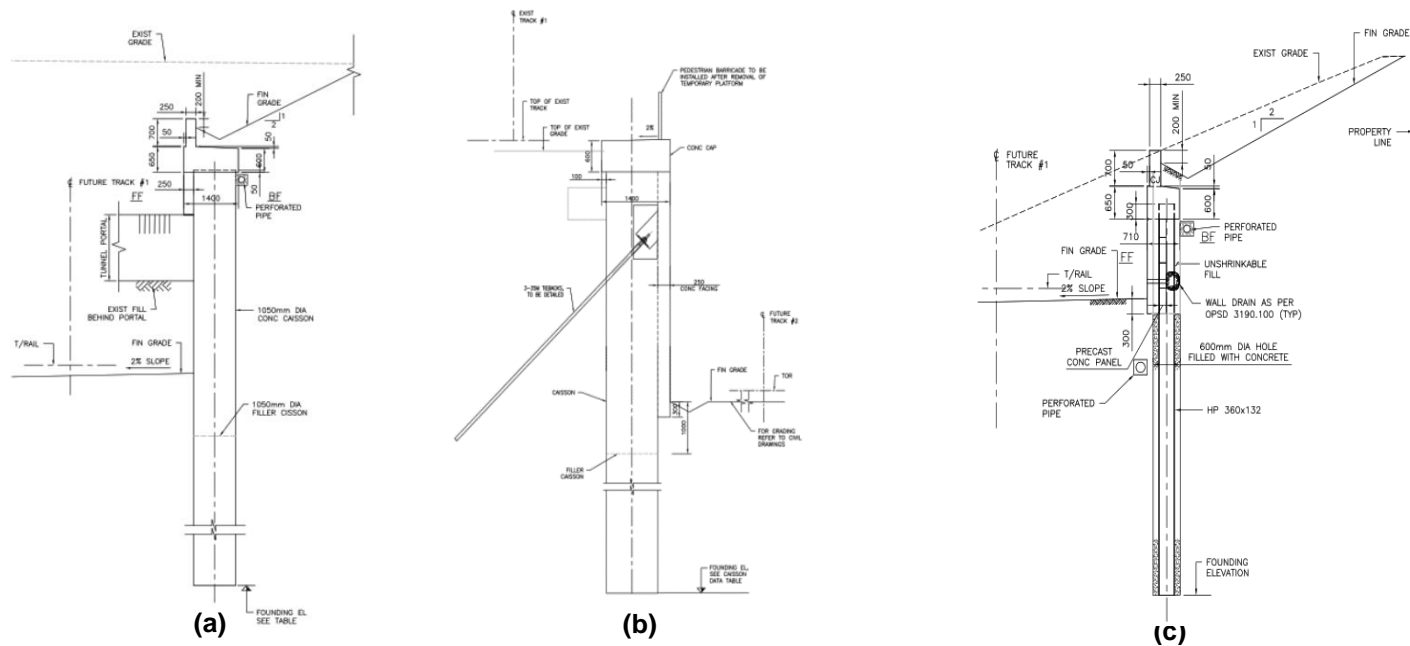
Types of Retaining Walls: (a) Secant pile wall, (b) Caisson Wall with tieback, (c) H-pile with lagging and concrete panel
